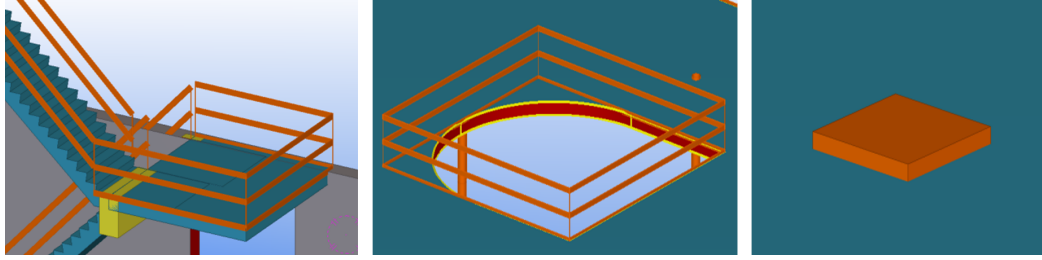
Examples of protective equipment for staircases, slab edges, and slab openings with different shapes/dimensions.
